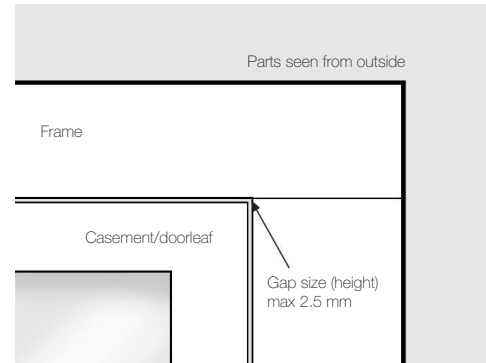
Adjusting casement height is done with the setting screw in the hinge.
